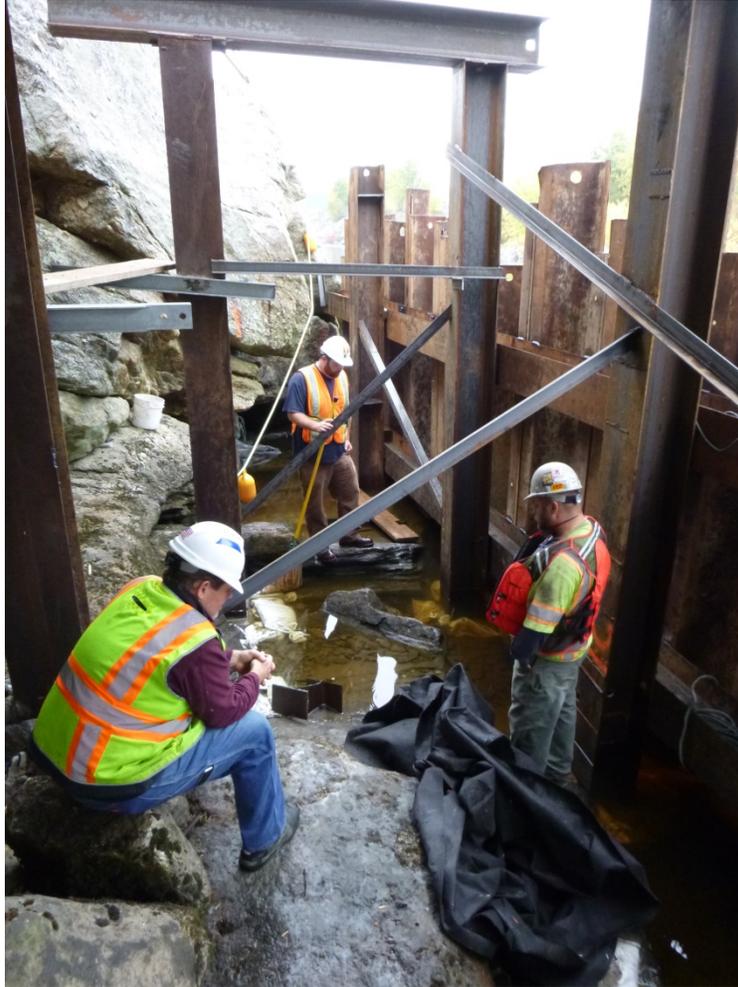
Example of the inside of a sheet pile cofferdam used for abutment construction on a bridge replacement project.
